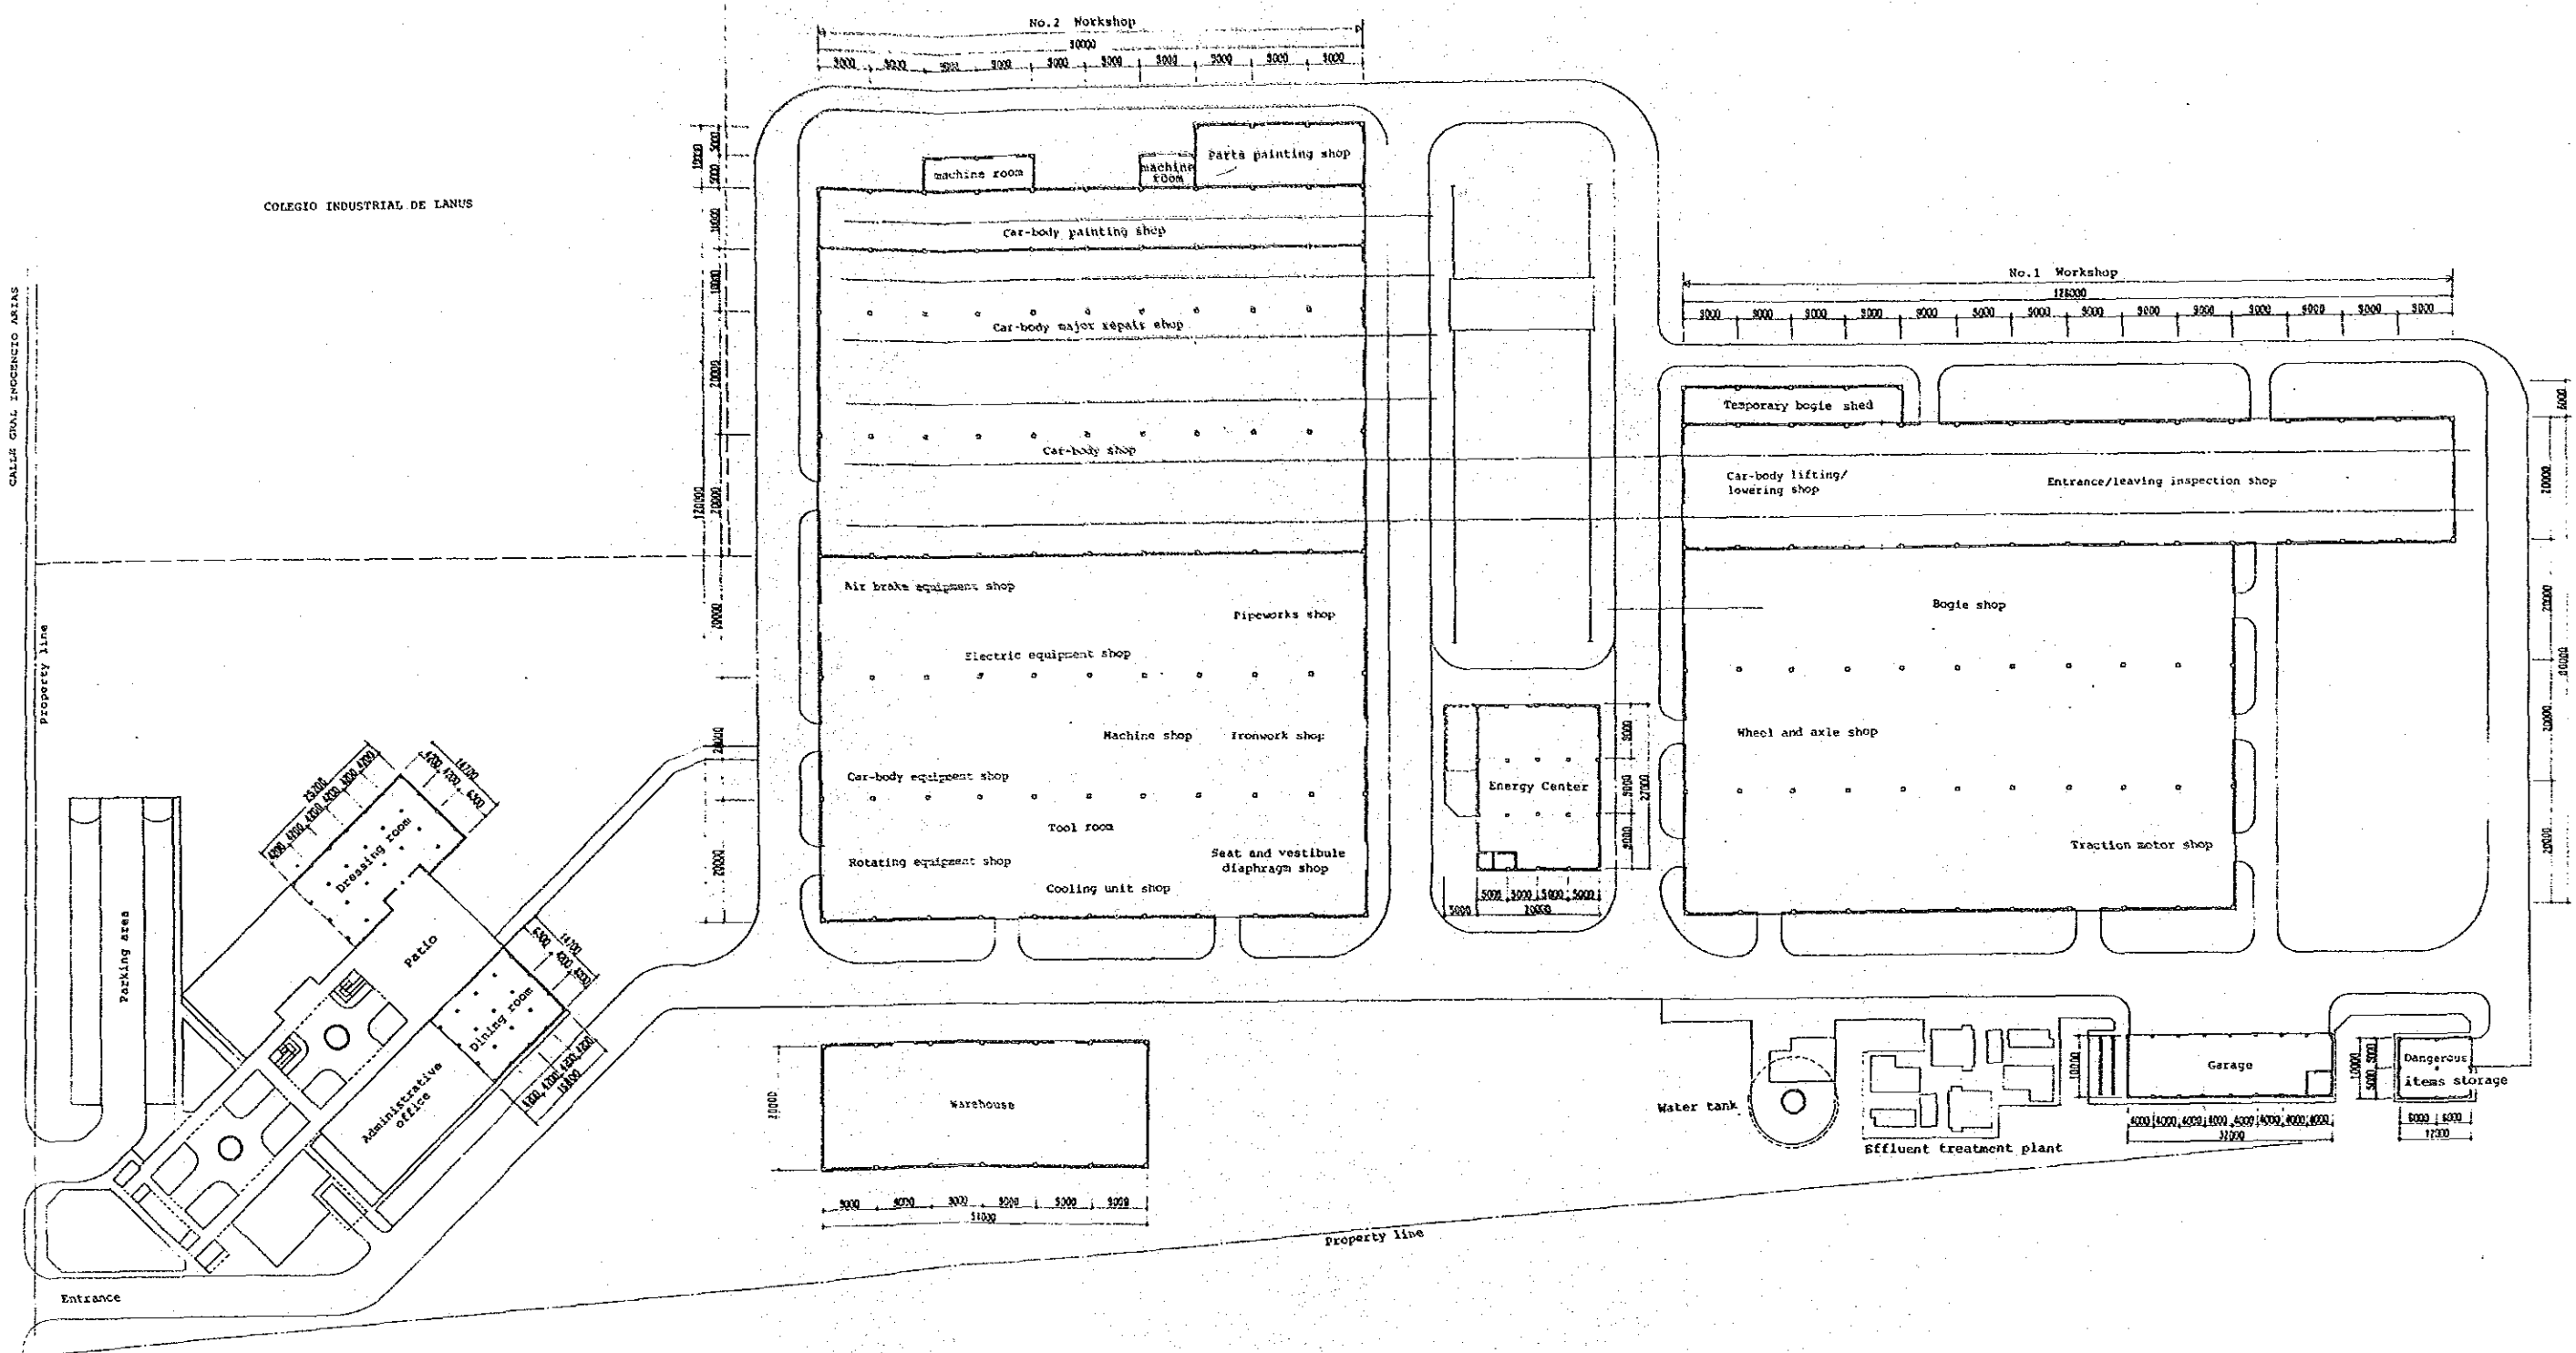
Layout of KM 10 Workshop Buildings Proposal III
